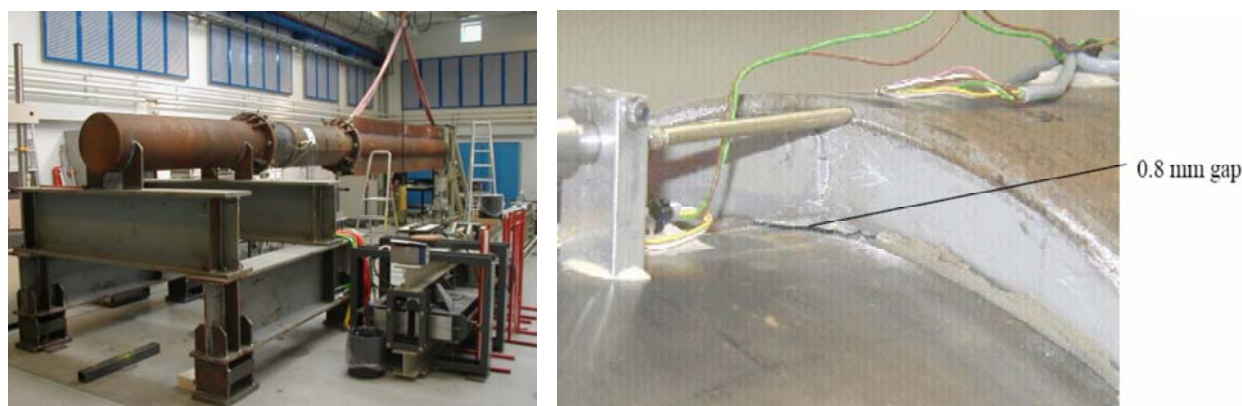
Gap opening between pile and grout in a) and between sleeve and grout in b).
